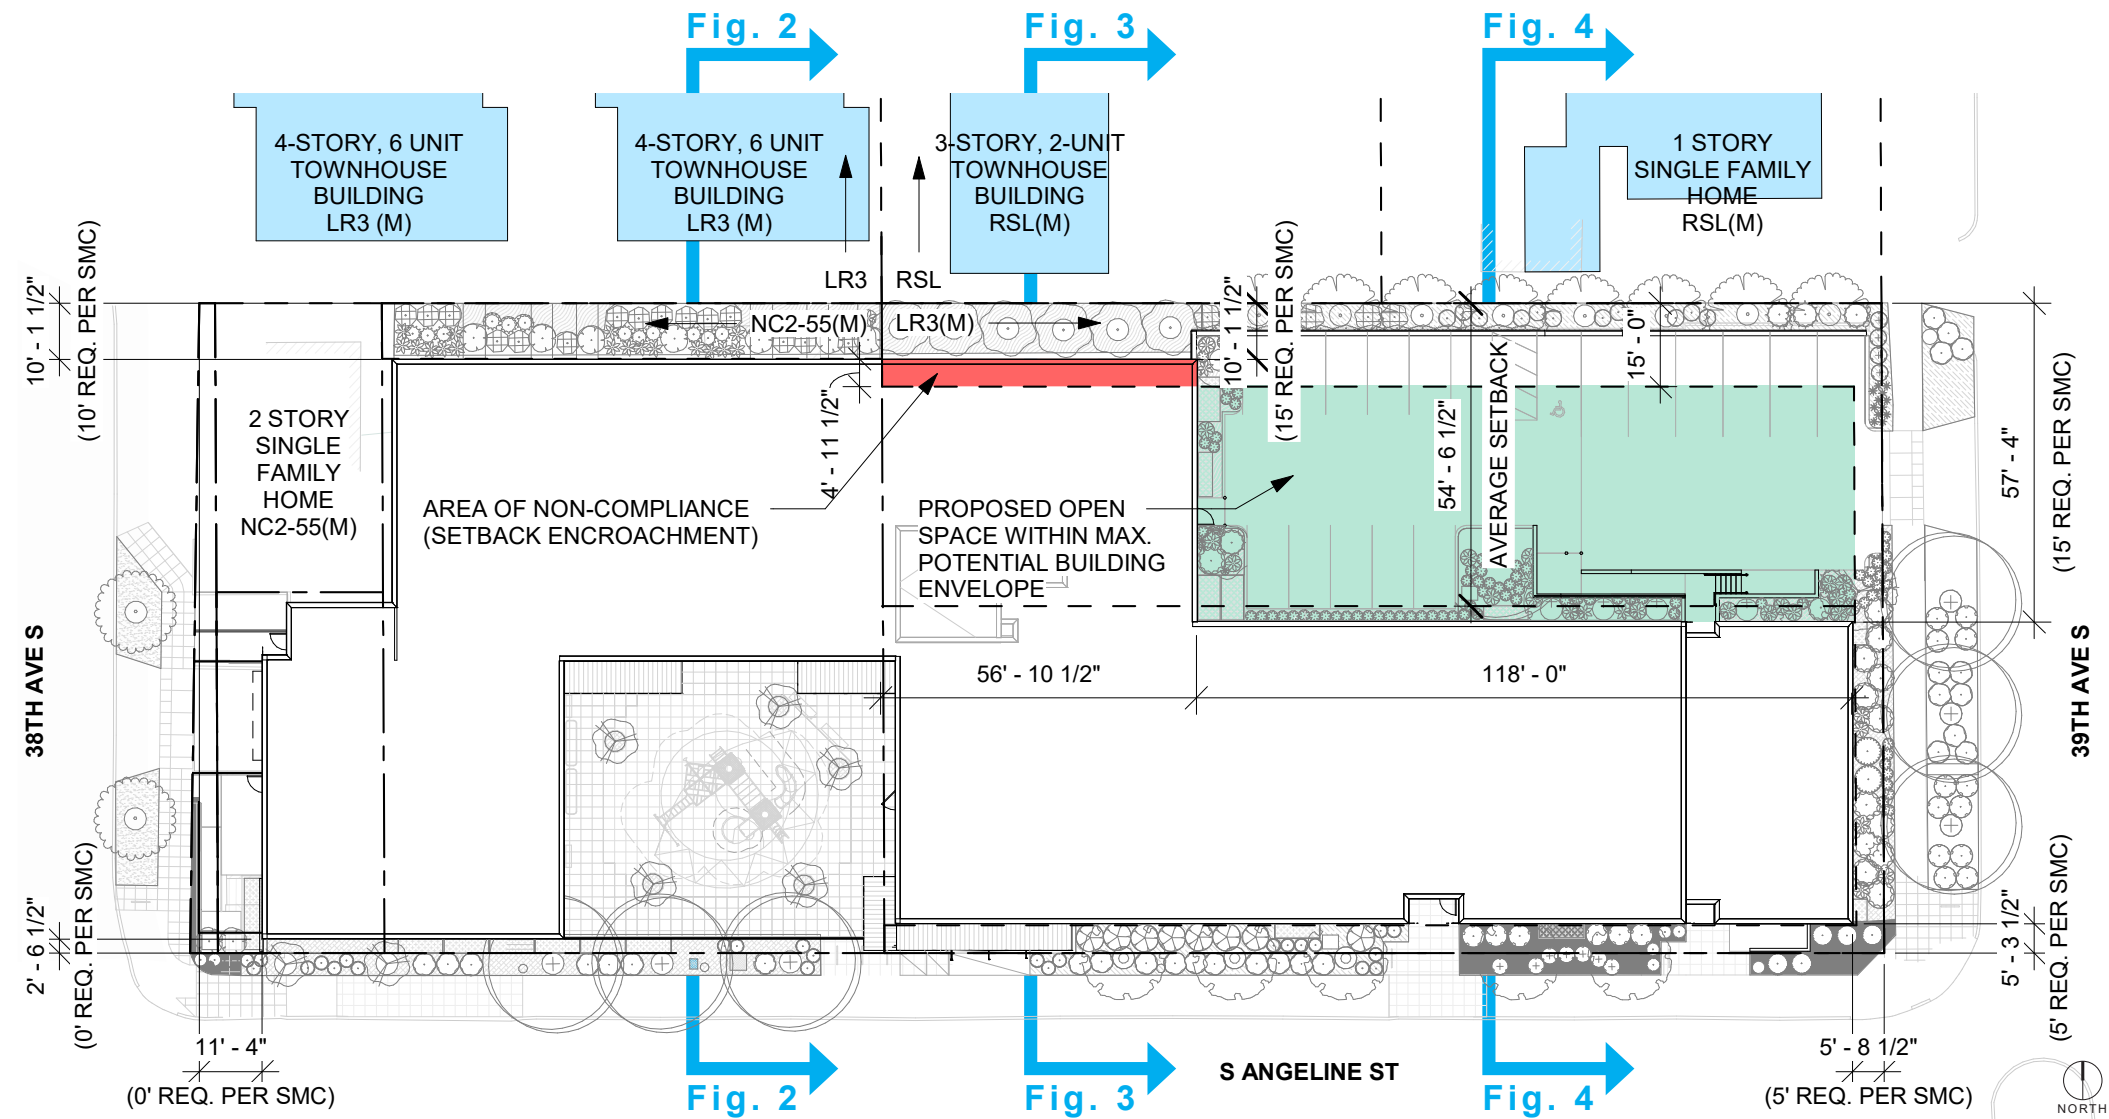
Site Plan showing area of setback encroachment, neighboring buildings, open space, and shape of building allowed by departure.
